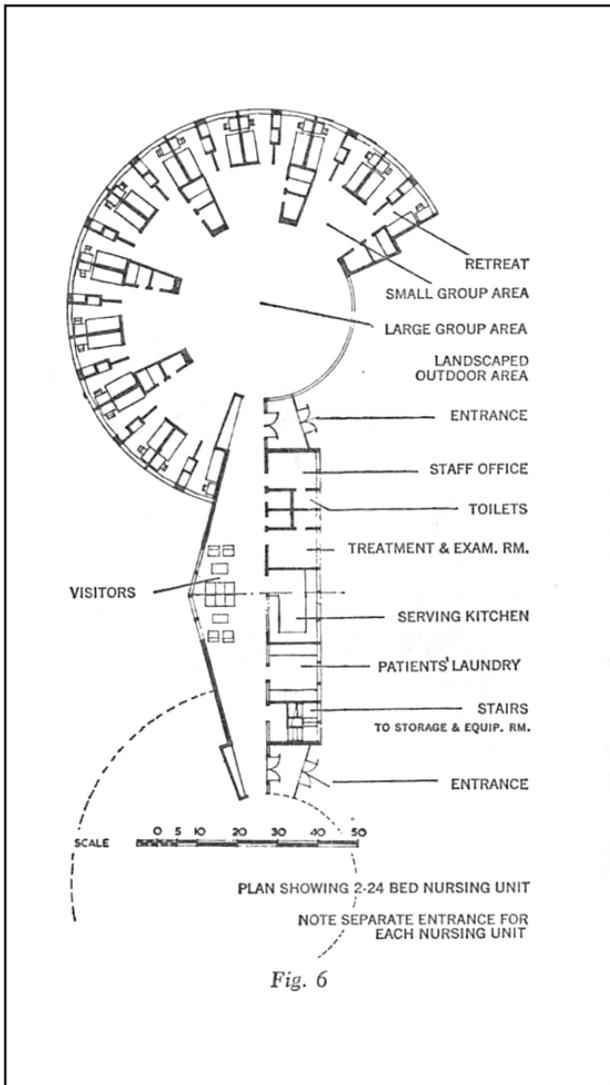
Plan by Kiyoshi Izumi for Saskatchewan. *Who Designs America?* The American Civilization Conference at Princeton, edited by Laurence B. Holland. (Garden City, N.Y., Anchor Books, 1966), 306
